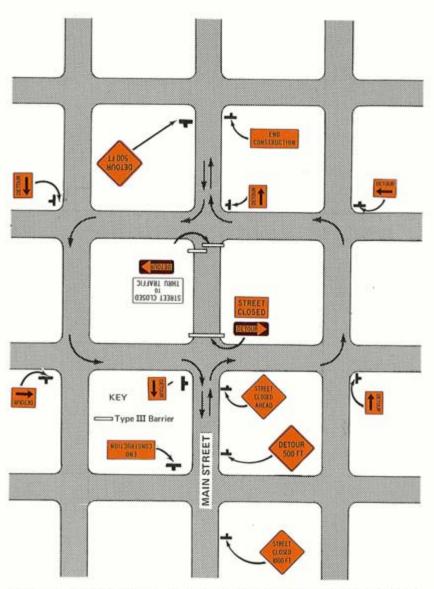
Typical application—detour signing for street construction project in a street grid.
